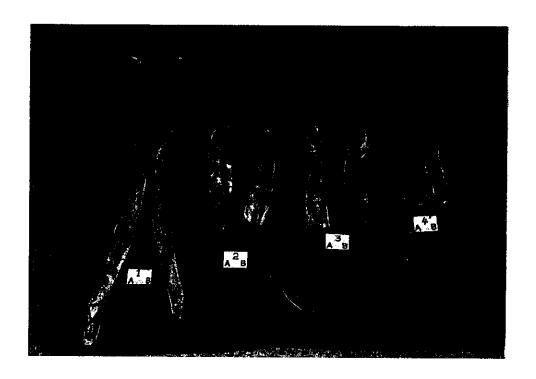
Conduit sections 1, 2, 3 and 4 cut for examination.
